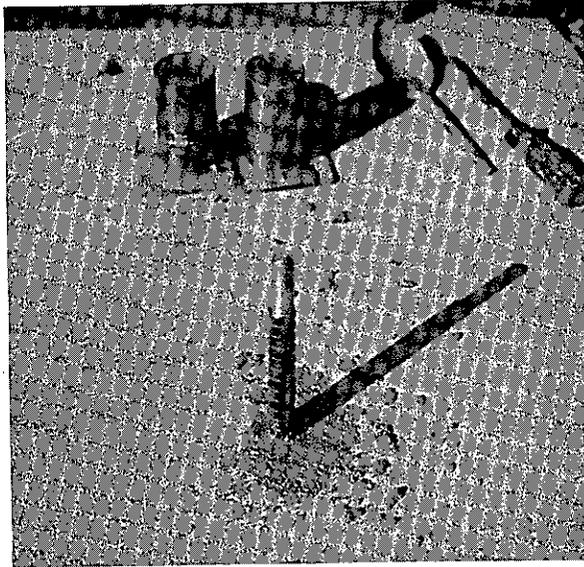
Single #6 rebar dowel bonded with Type II Modified portland cement grout.
